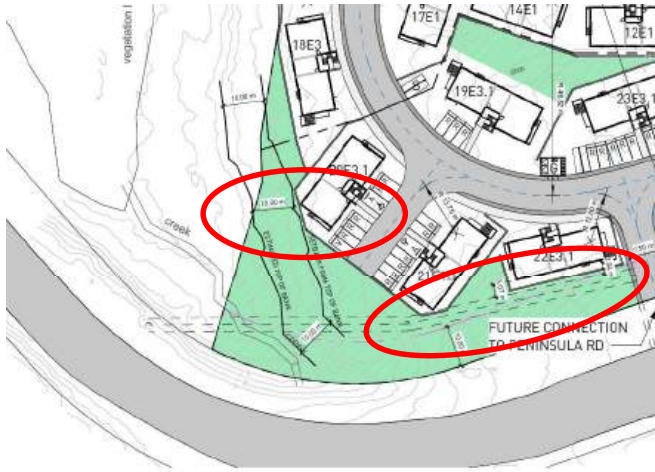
Architectural drawing A201. Retaining wall footings within setback from fish-bearing stream? Also, building setback from overhead hydro lines?
